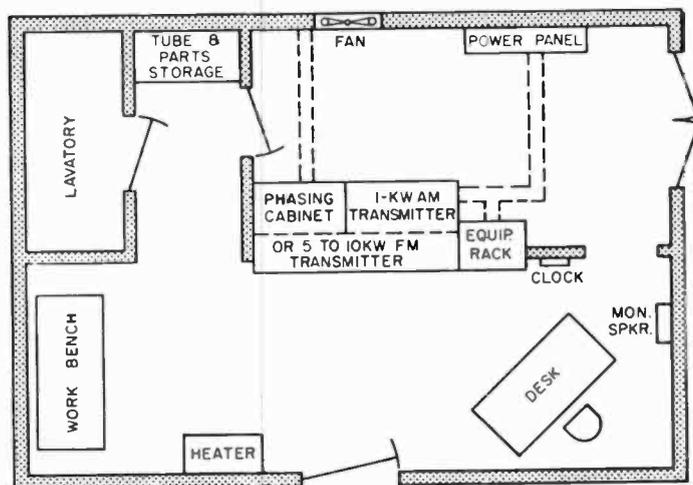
Typical transmitter building layout for a one-kilowatt AM directional. Floor plan can also accommodate up to a 10-KW FM transmitter.
